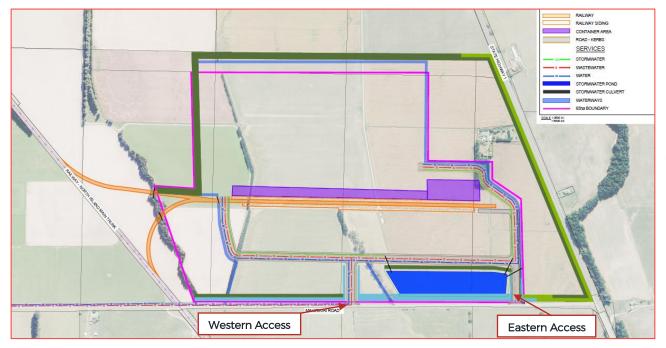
Proposed Site Access Locations onto Makirikiri Road
